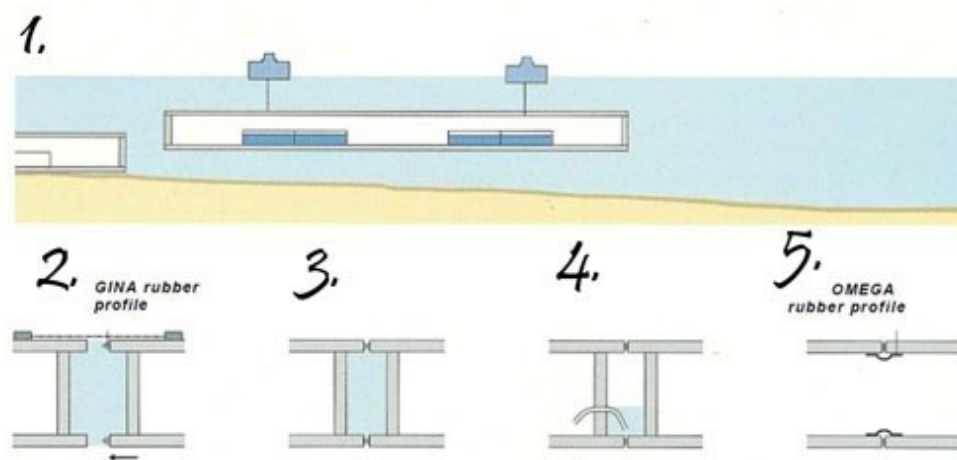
Connections of an immersed tunnel element with GINA and OMEGA profile [Ref Image 2]
